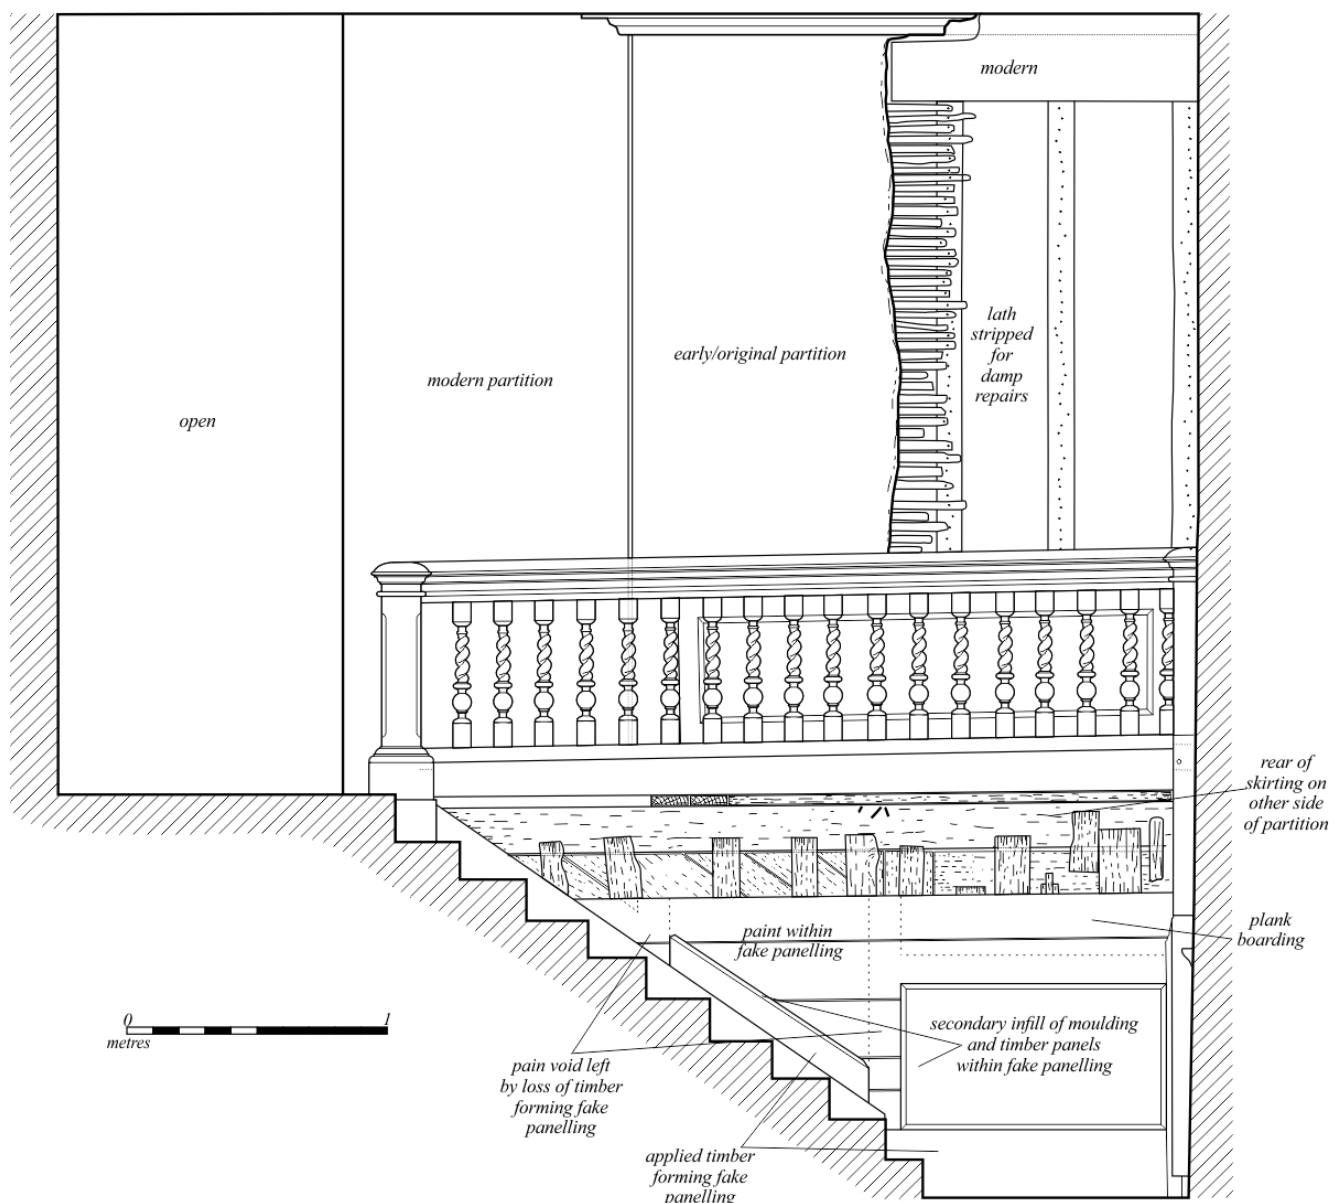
F.01 stairwell exposed panelling on the northern elevation
